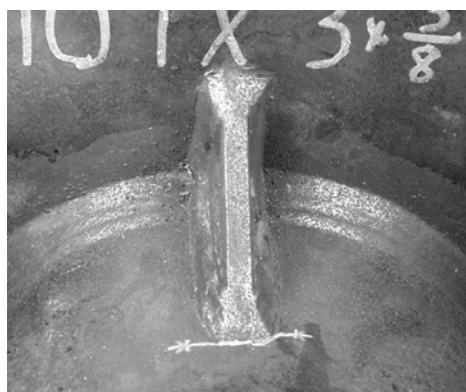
Typical Fatigue Failure of Fillet-Welded Socketed Connections (Koenigs *et al* 2003).
